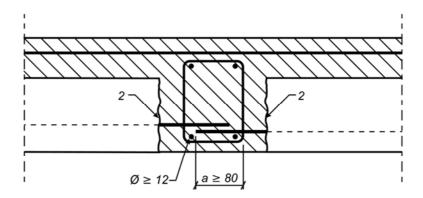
to D.8 give examples of construction arrangements that may be adopted in the case of beams supported from an embedded main beam or a main beam above the floor.
